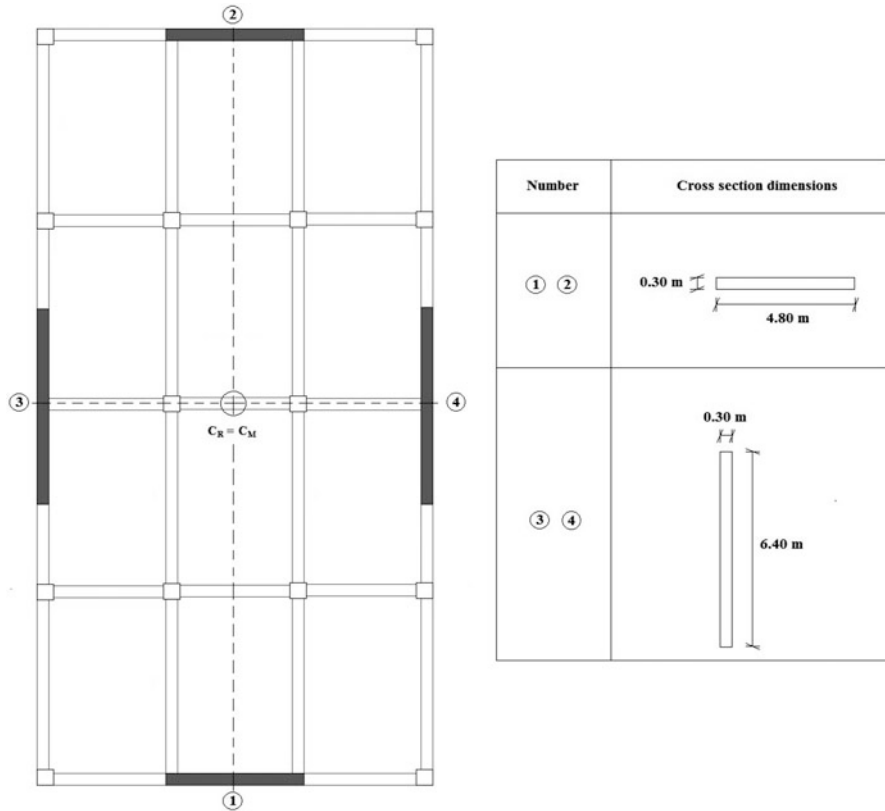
Dimension and geometrical arrangement of the shear walls
